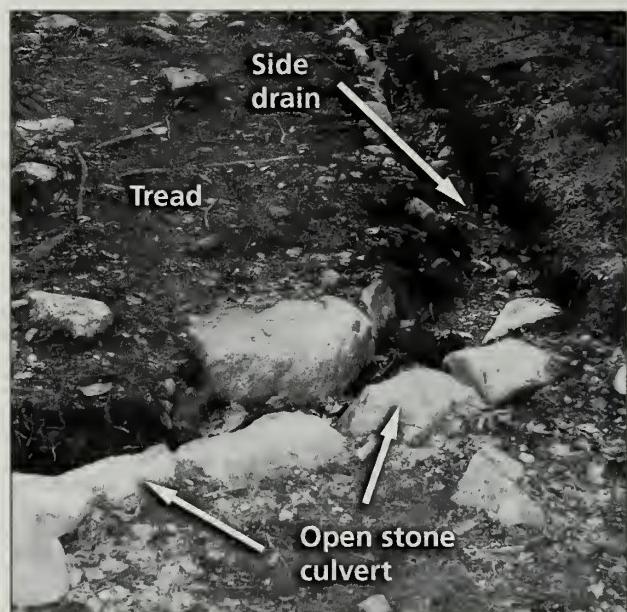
Ditch and fill work with an open stone culvert on the Long Pond Trail (#118).
